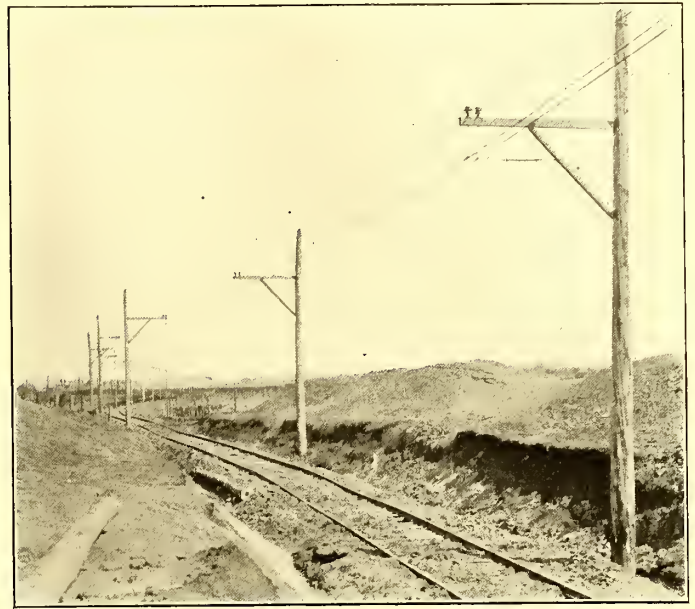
VIEW SHOWING CATENARY LINE CONSTRUCTION
